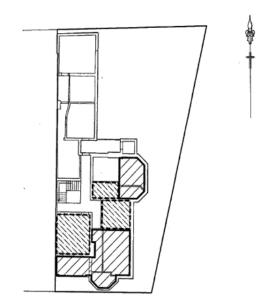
148 New South Head Road, First Floor Source: Anka Property
